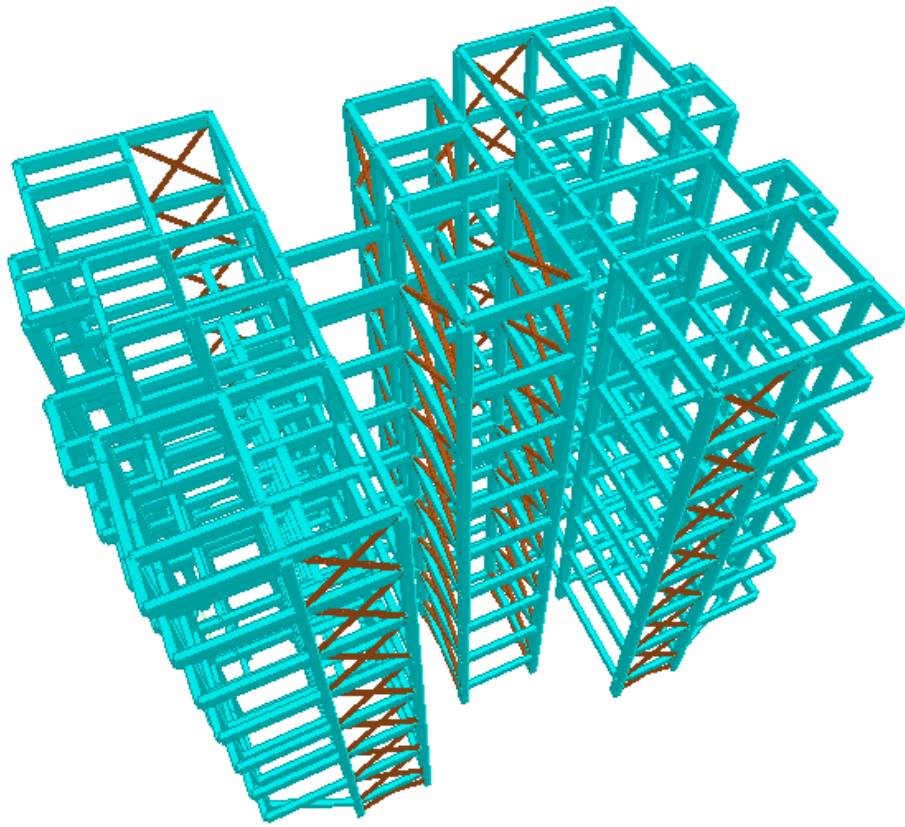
(a): Model 5 – 3D model in StaadPro showing Bracing locations
